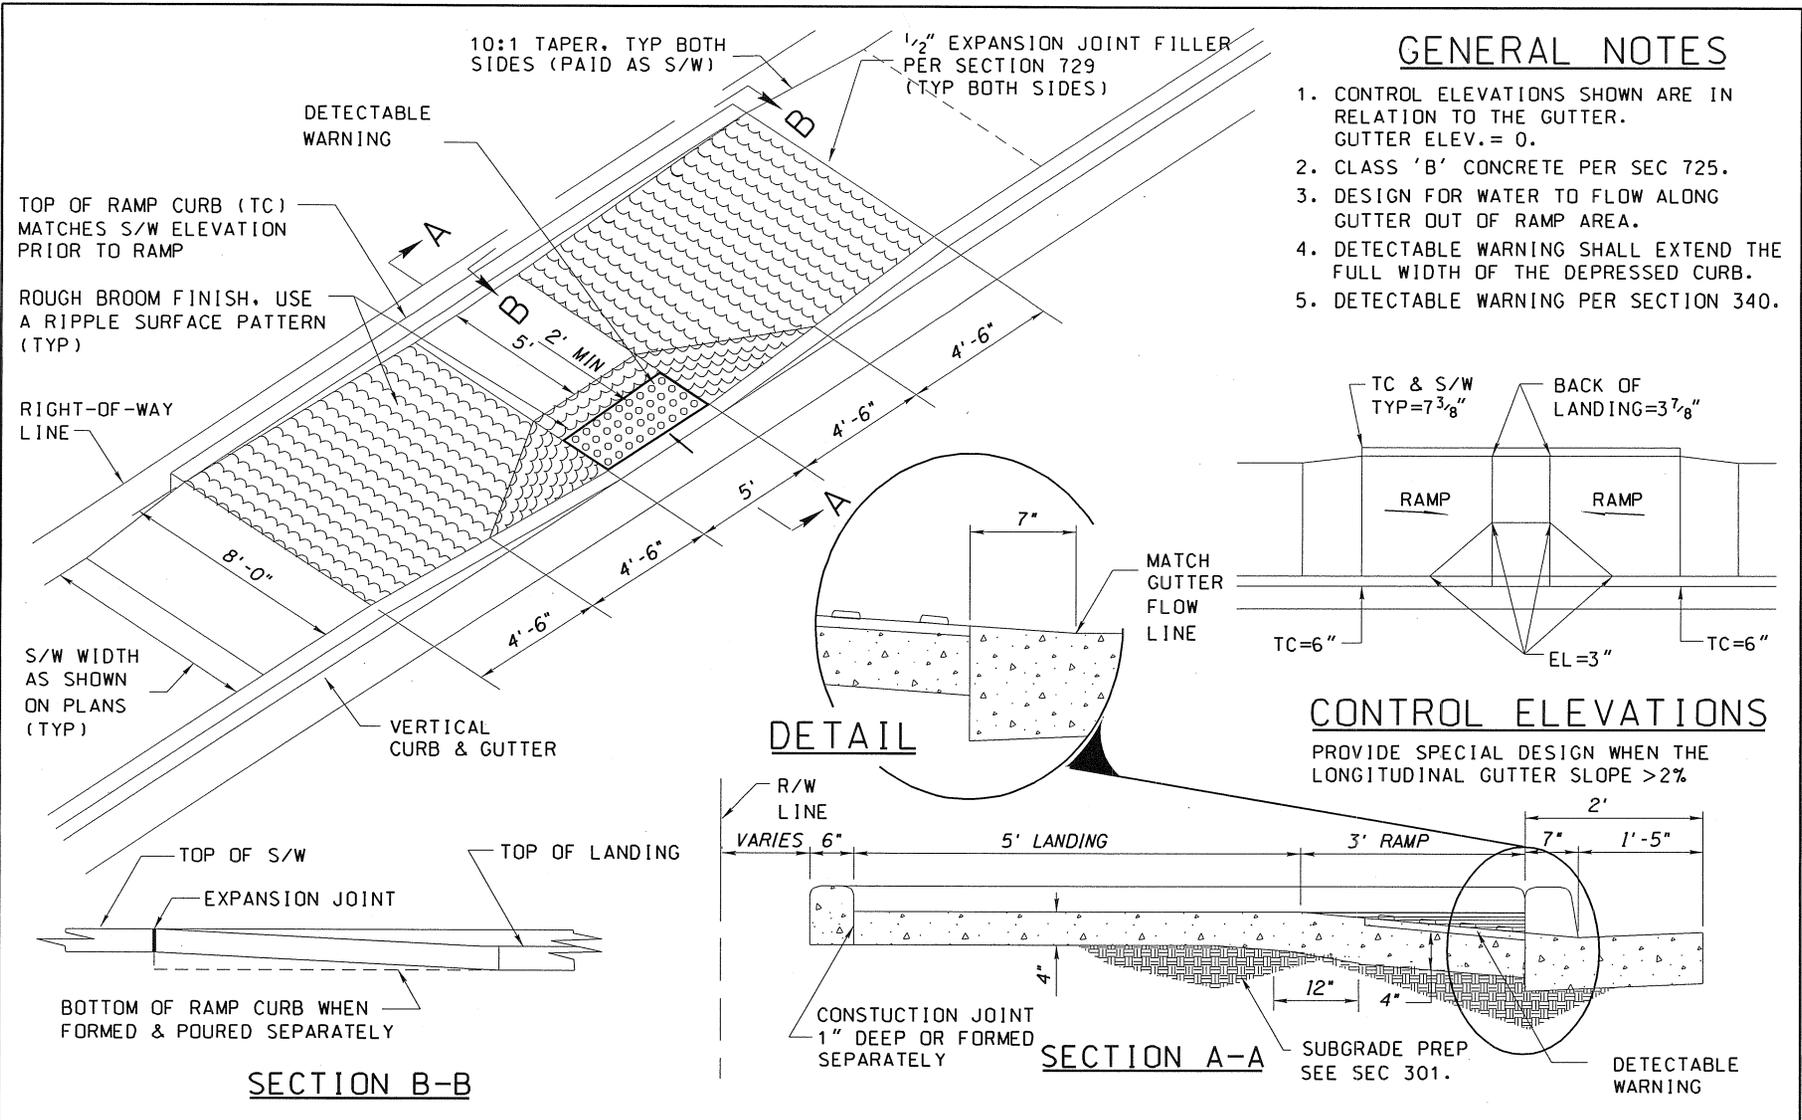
STANDARD DETAIL Revised April, 2000	SIDEWALK RAMP WITH ROLL CURB	CITY OF APACHE JUNCTION PUBLIC WORKS/ENGINEERING (480) 982-1055	DETAIL NO. AJ-PW233
